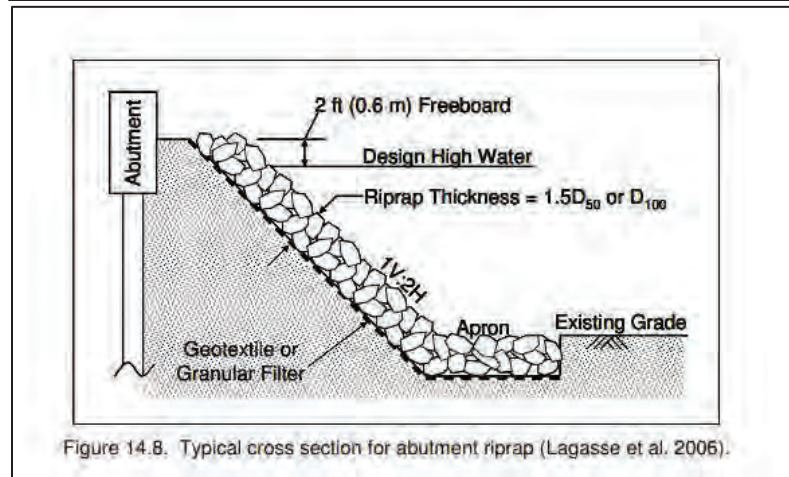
Typical cross section for abutment riprap (Lagasse et al. 2006).
